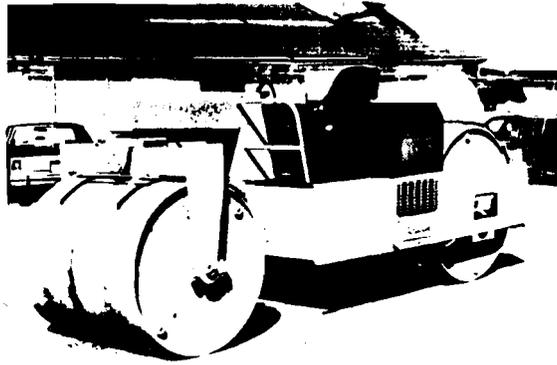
Smooth-wheel Roller, Diesel Powered
